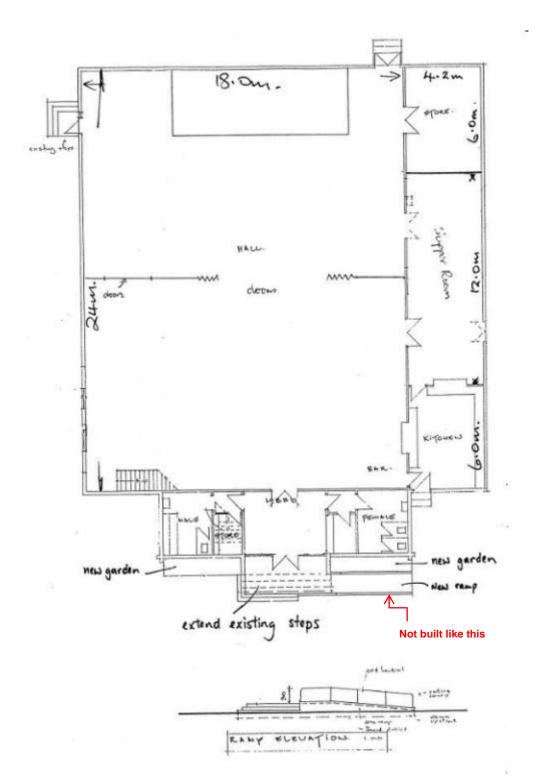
Plan Sketch Showing Ground Floor Layout as per 1992 Alterations
